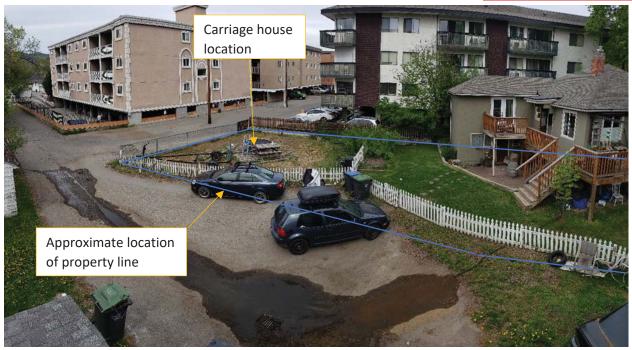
View of proposed carriage house location on subject property. Photo taken facing north-east.
